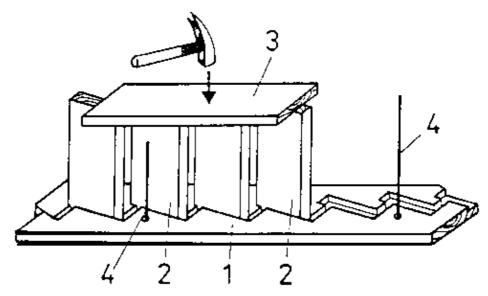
Beating–in of the steps – 1 stair string, 2 step, 3 wooden pad (to avoid bearing marks), 4 screw rod
